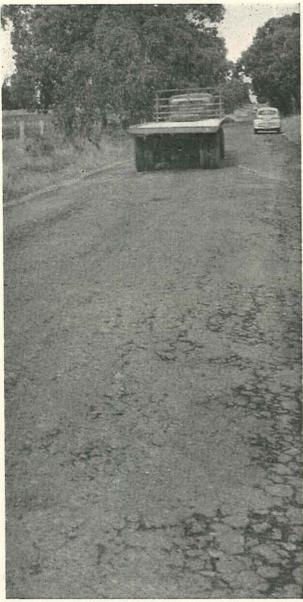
Failed Pavement on Stud Road One Mile North of Ferntree Gully Road.
